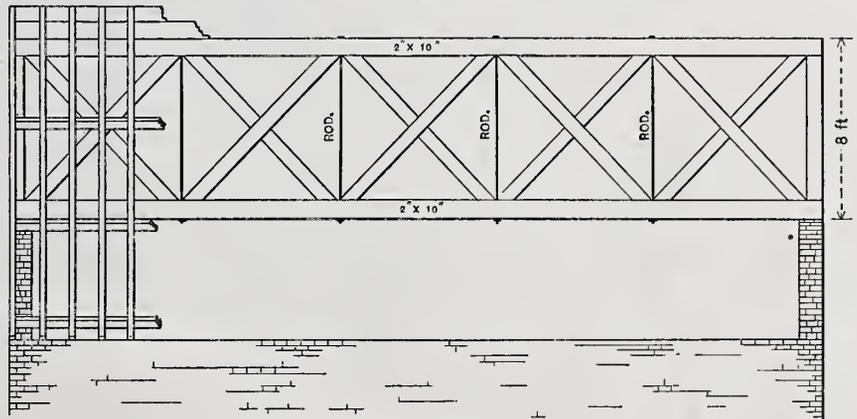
Side Elevation of Howe Truss recommended by W. H. F., in Connection with Rafters Arranged as shown in the Preceding Cut.
